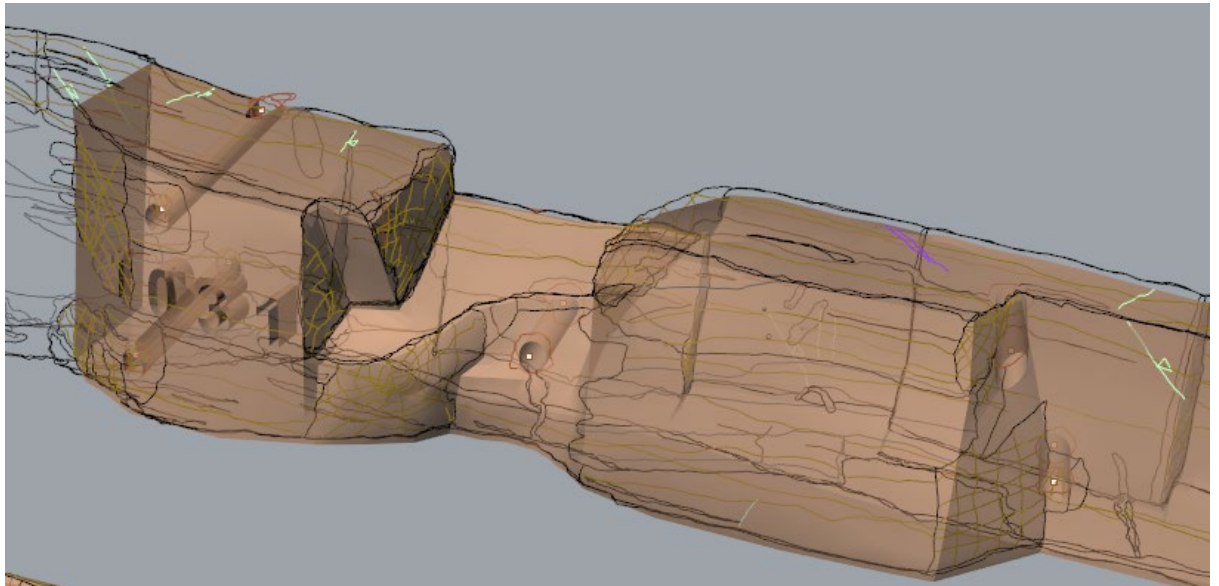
Detail of a Beam Swelling on Stringer STRS 7.1- CT1031
